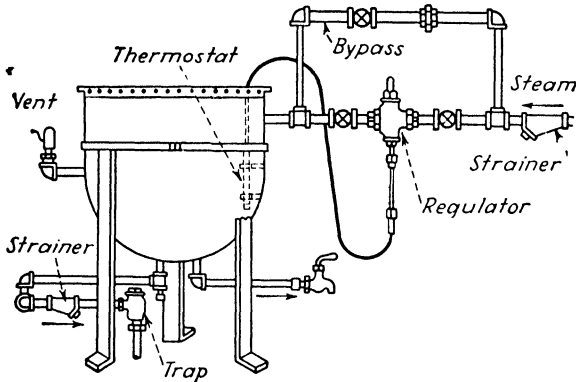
Regulating valve in steam line is actuated by thermal bulb inside the kettle. (Courtesy of Sarco Co., Inc.)
